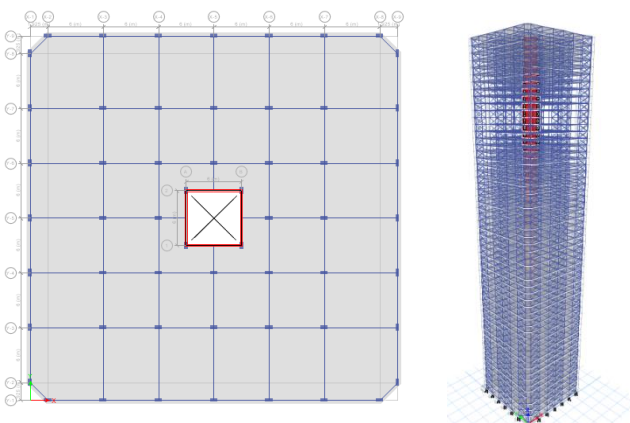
Plan and 3D Elevation for Braced Frame Structure
